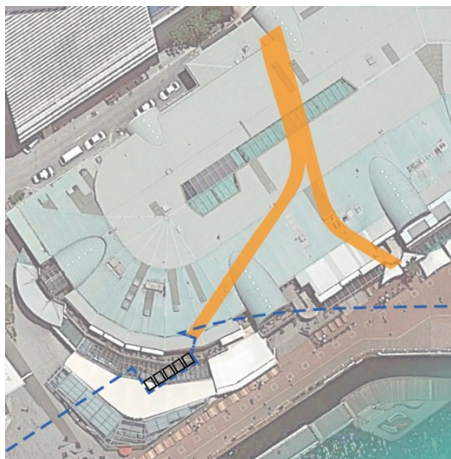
Overlay showing intake entrance in relation to plan of conduit.
